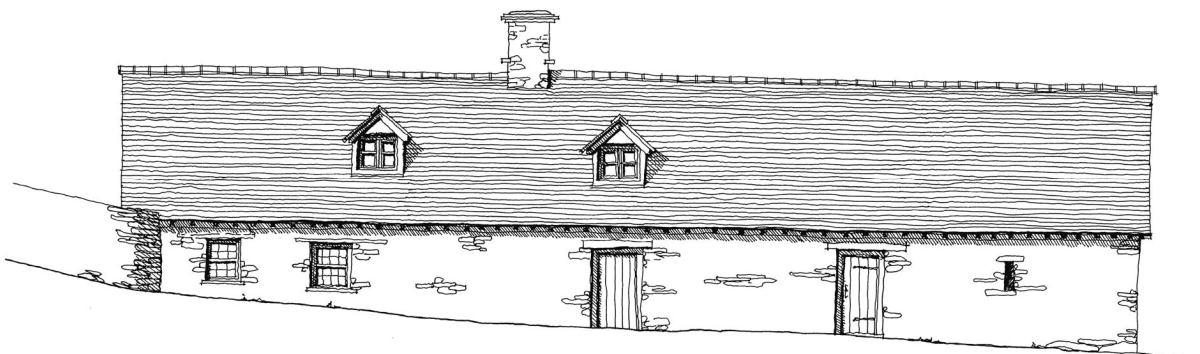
South-east elevation of Llannerch y Cawr 1:200
